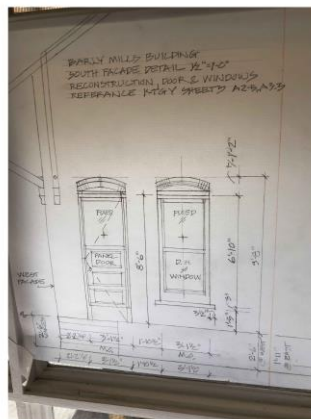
Barley Mills Building: Reconstruction of c 1891 era doors and windows with dimensions of existing conditions and interpretive canopy roof framing. Proposed section and elevation. Source of field survey, GT Loudon Historical Architect; ktgy Architecture + Planning, sheet number A2-8.
